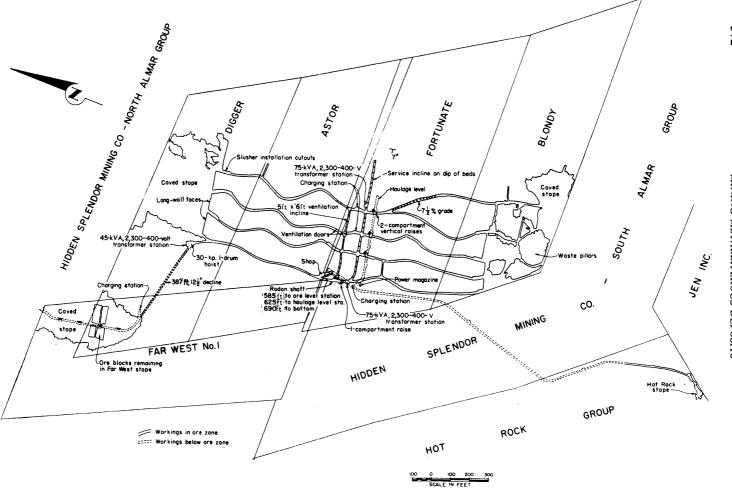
Plan of workings, Radon Uranium Mine.⁽⁷⁾
